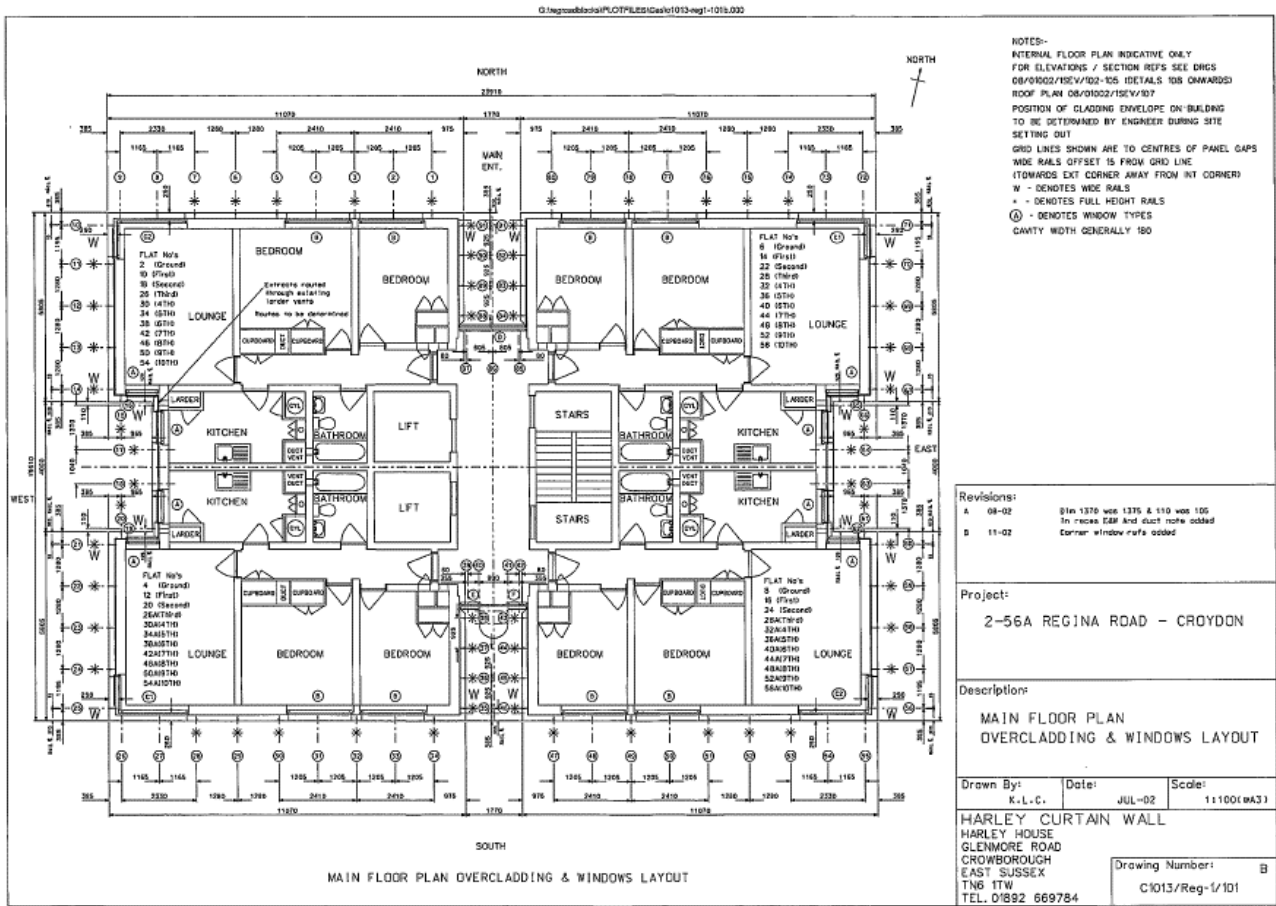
Overcladding record drawings Main Floor Plan 2-56A dated July 2002 showing typical flat layout
